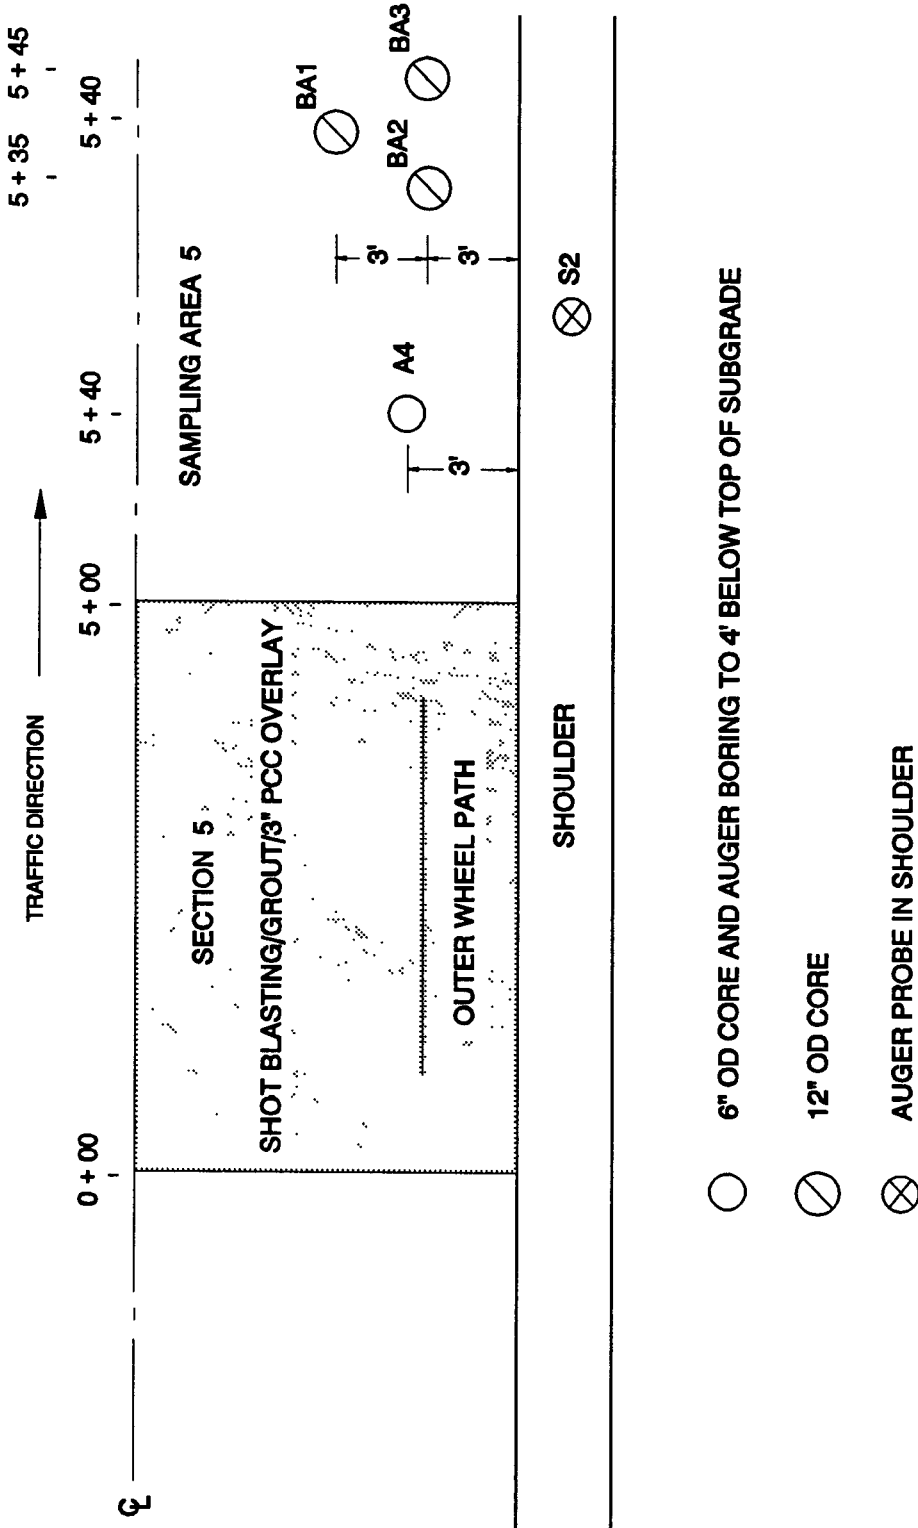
Example of "Pre-Construction" Sampling Plan for Test Section 5
